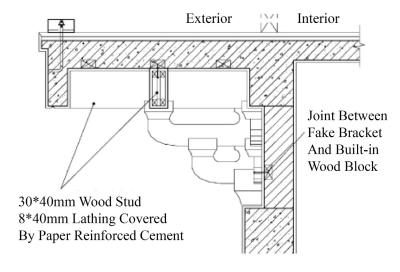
Construction Details of Fake Bracket Attached on Concrete Frame
